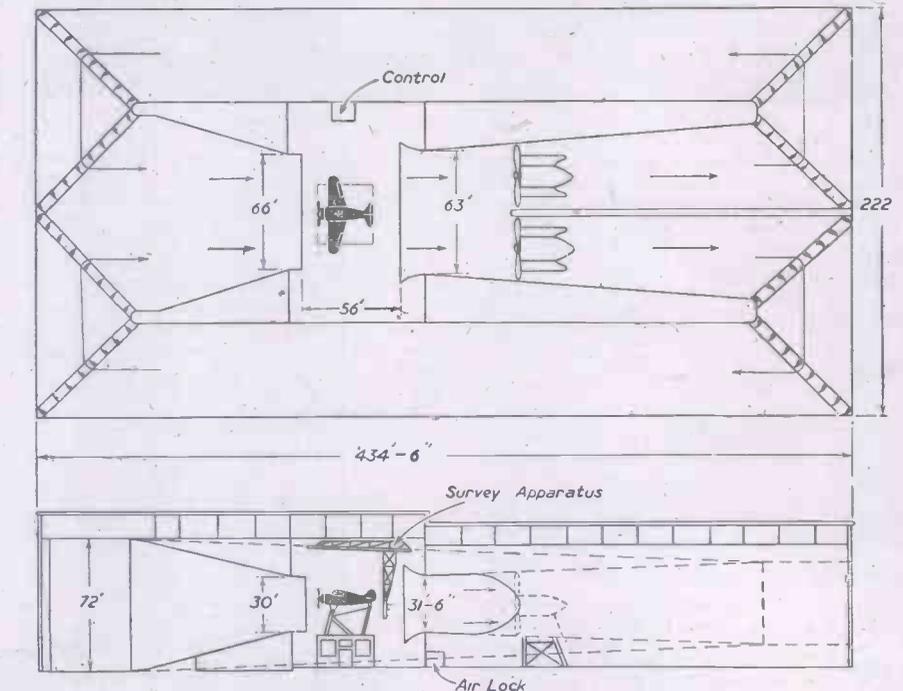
Plan and section of the N.A.C.A. wind tunnel.
